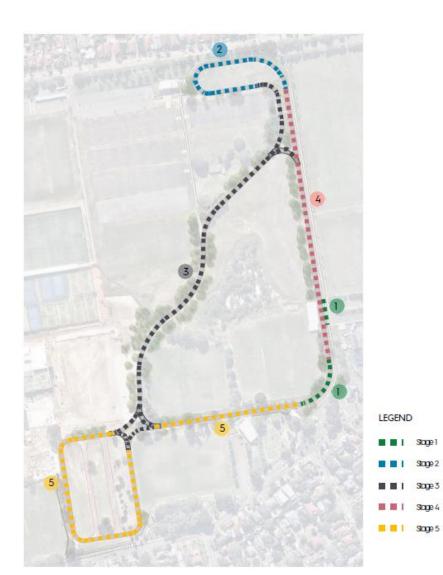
Heffron Park Criterium Track: Proposed staging plan
